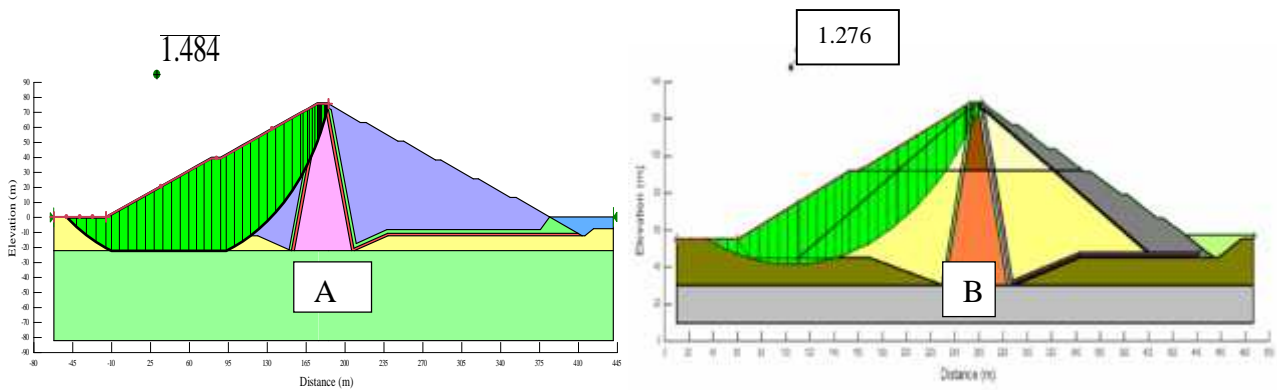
Minimum factor of safety of (A) revised section and (B) original design during second stage construction
